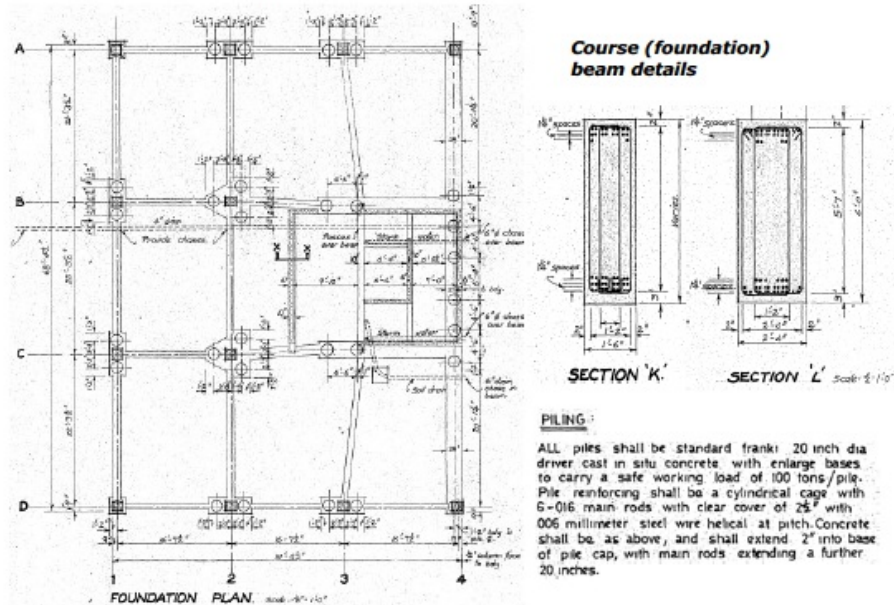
Foundation system. Left: foundation plan view; right: course beam details and piling information
